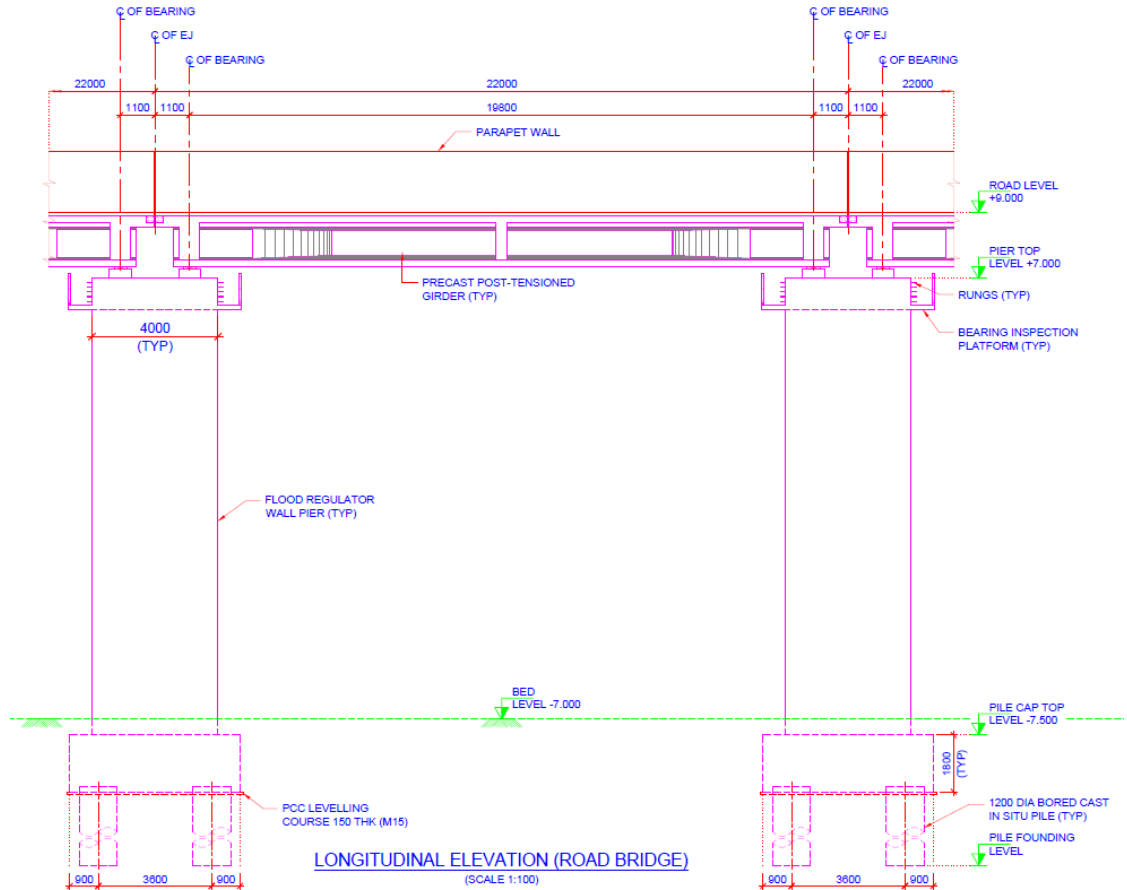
Elevation of wall pier supporting roadway superstructure
